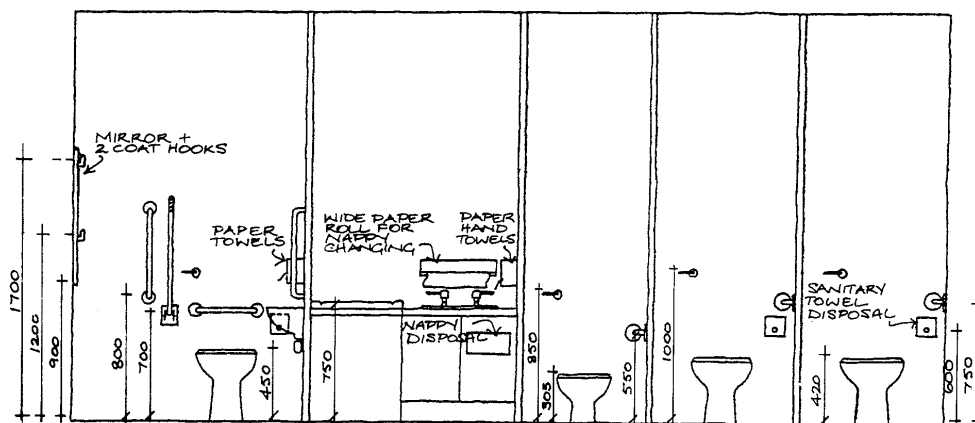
Elevated view of accessible cubicle, nappy changing, child and adult cubicles. WDS,1990:58.
